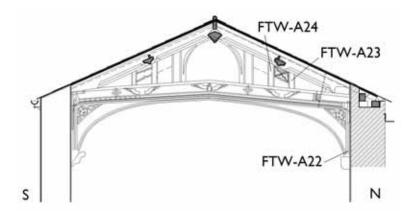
East elevation of principal truss 11, showing the location of samples FTW-A22-24 (Freeland Rees Roberts Architects)
